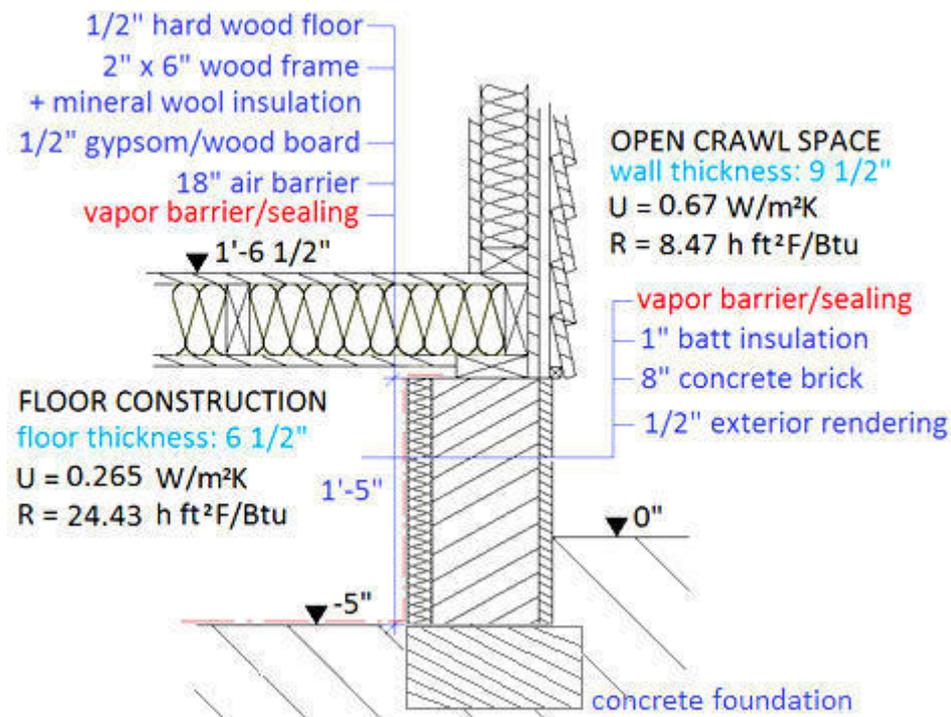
Proposed floor and open crawl space construction for the renovated landmark
